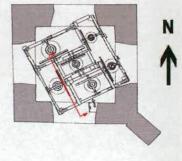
Sectional views: sheet 3 of 6 (drawing by Bill Blake/Andy Crispe)
